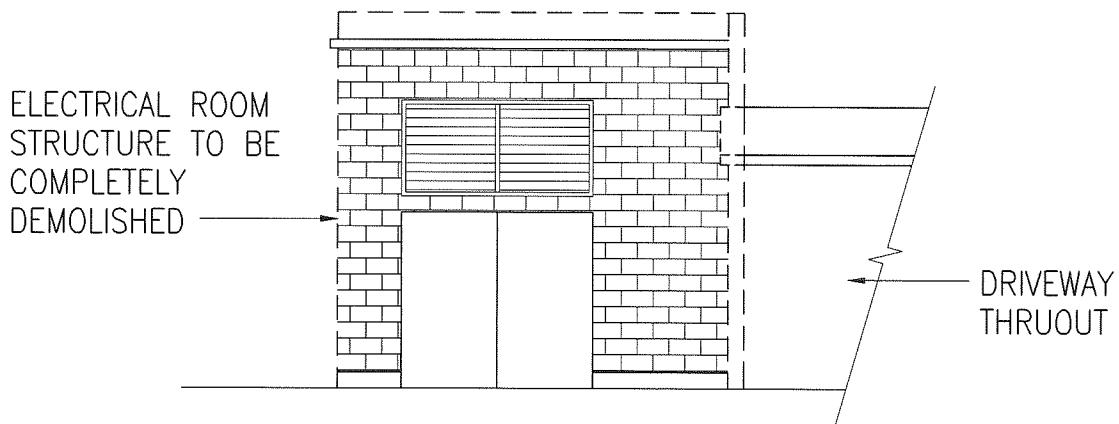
FRONT ELEVATION OF ELECTRICAL ROOM
